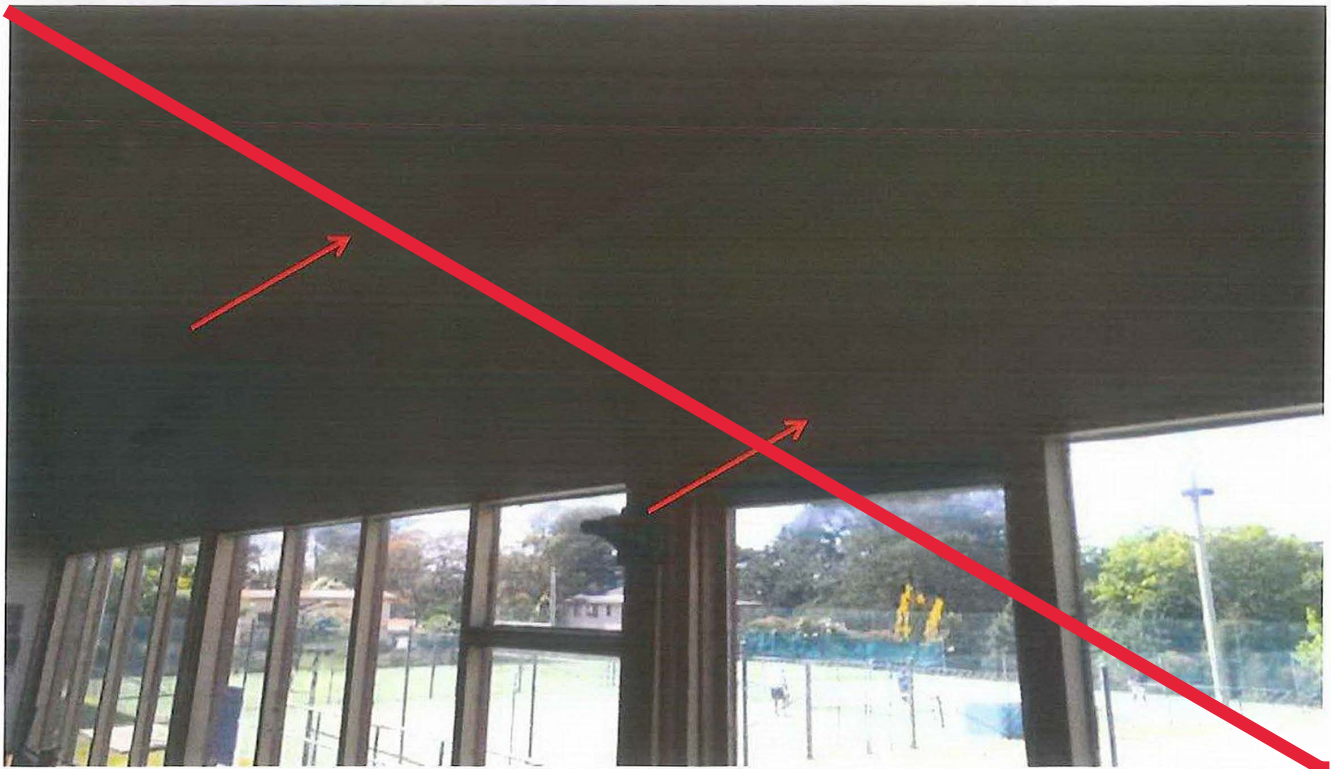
Asset D00153 – Jubilee Park, Blackheath – Tennis Clubhouse – main room (sunroom) – fibreboard containing asbestos ceiling lining and internal wall cladding above windows.
